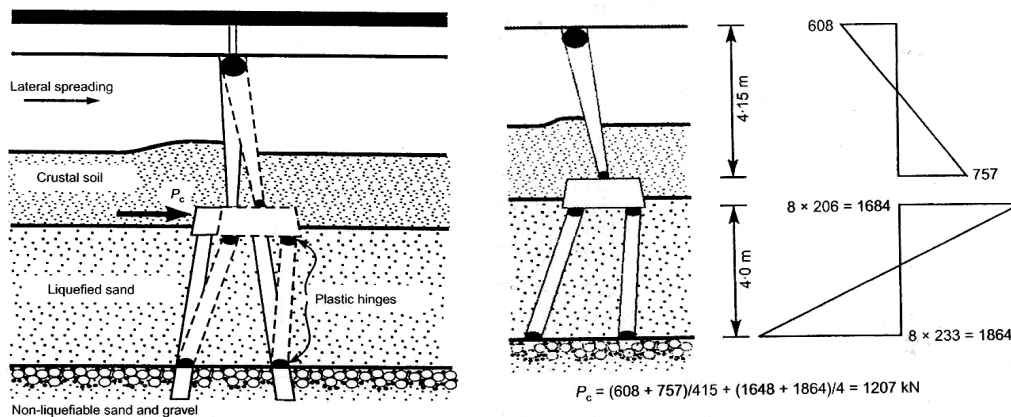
(a): Assumed substructure collapse mechanism to predict the capacity of the foundation (after Berrill et al. 2001); (b): Collapse load for the pier system calculated from plastic moment (after Berrill et al., 2001).
